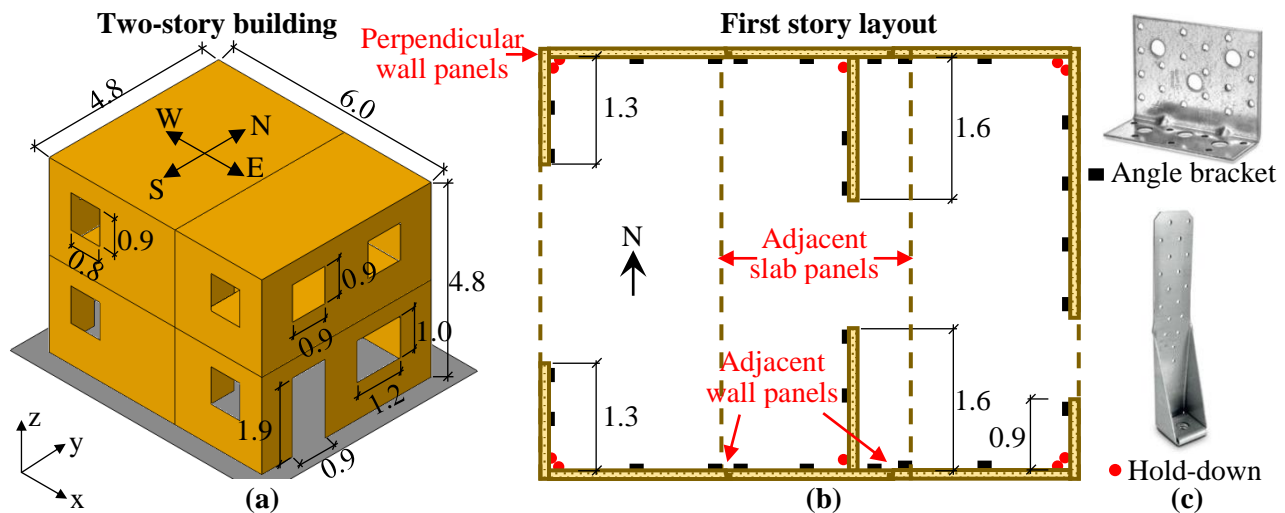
(a) Overview of the two-story CLT building, (b) first story plan [13], and (c) CLT panel connections used (dimensions in meters)
